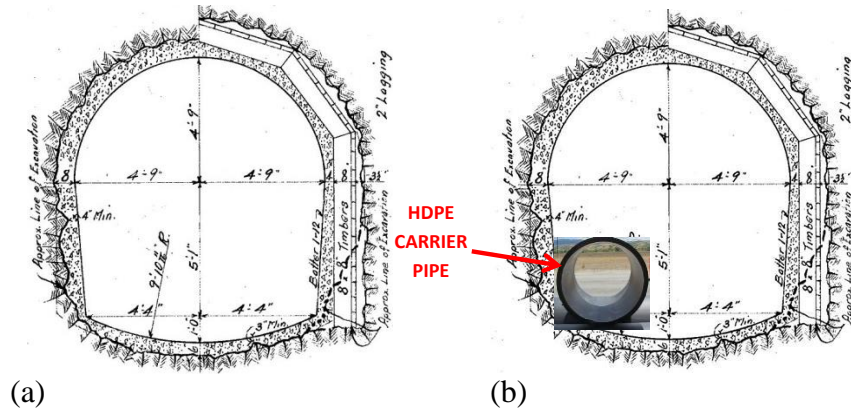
Los Angeles Aqueduct Elizabeth Tunnel crossing the San Andreas Fault: (a) Typical cross section of Elizabeth Tunnel; (b) Example proposed retrofit with HDPE carrier pipe.
